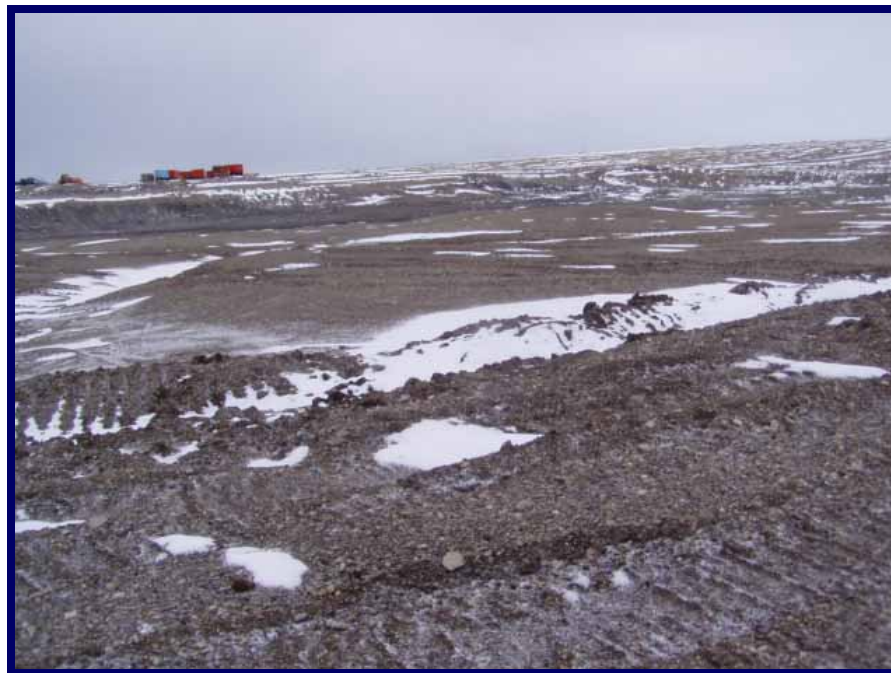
General view of reclaimed area west of New Quarry, looking west from haul road in previous photo towards Teck Cominco's temporary camp.
